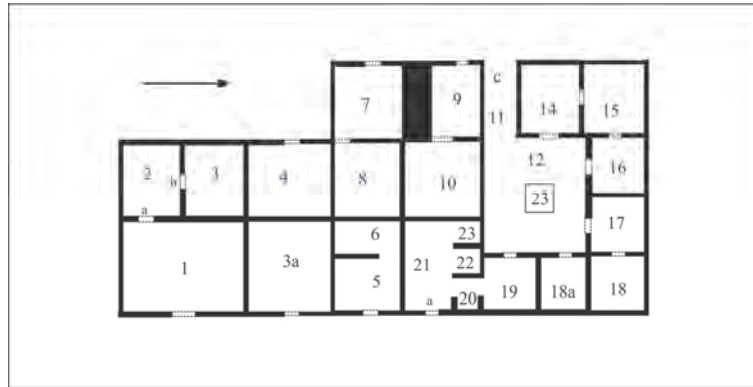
Plan of the roman house II (after KIRÁLY 1891)
